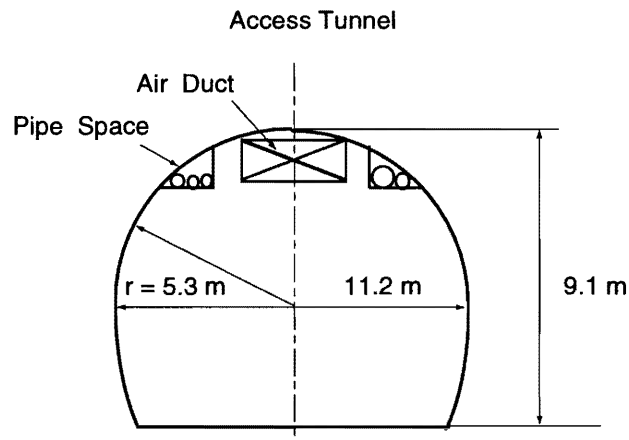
Cross section of the access tunnel (excavated by NATM) to the main linac excavated by TBM.
